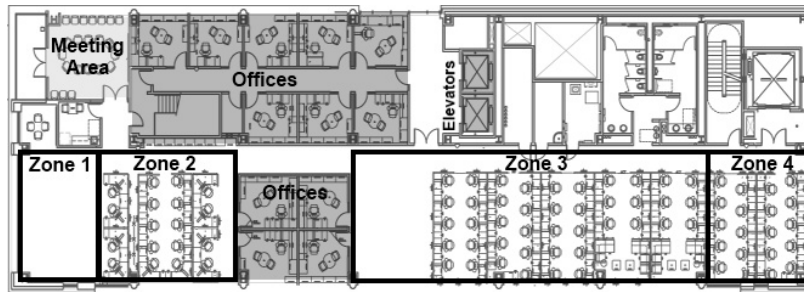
Floormap of the 7th floor showing a large open collaboratory and a smaller area of individual offices. The collaboratory is broken into 4 independently controllable lighting zones. Side zones 1 and 4 have large windows facing West and East respectively. Zone 1 is a common space used for meetings; all other zones consist of individual desks.
